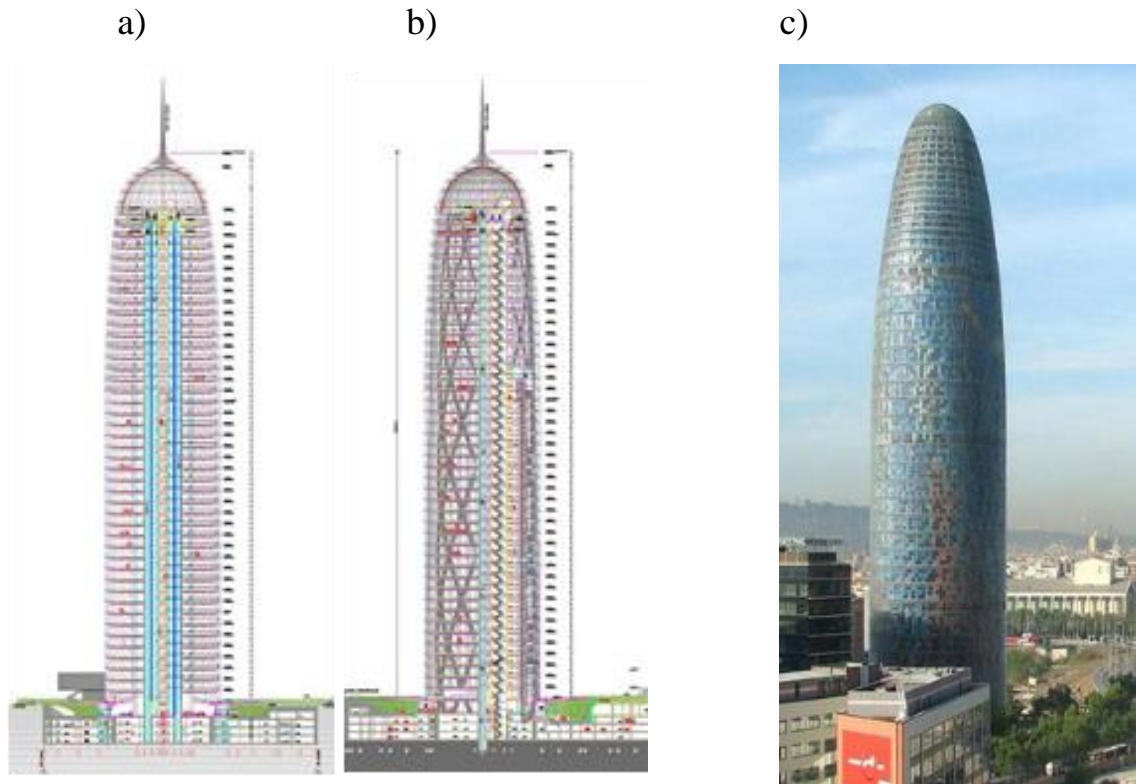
High-rise building “Torre Aigues de Barcelona”:
